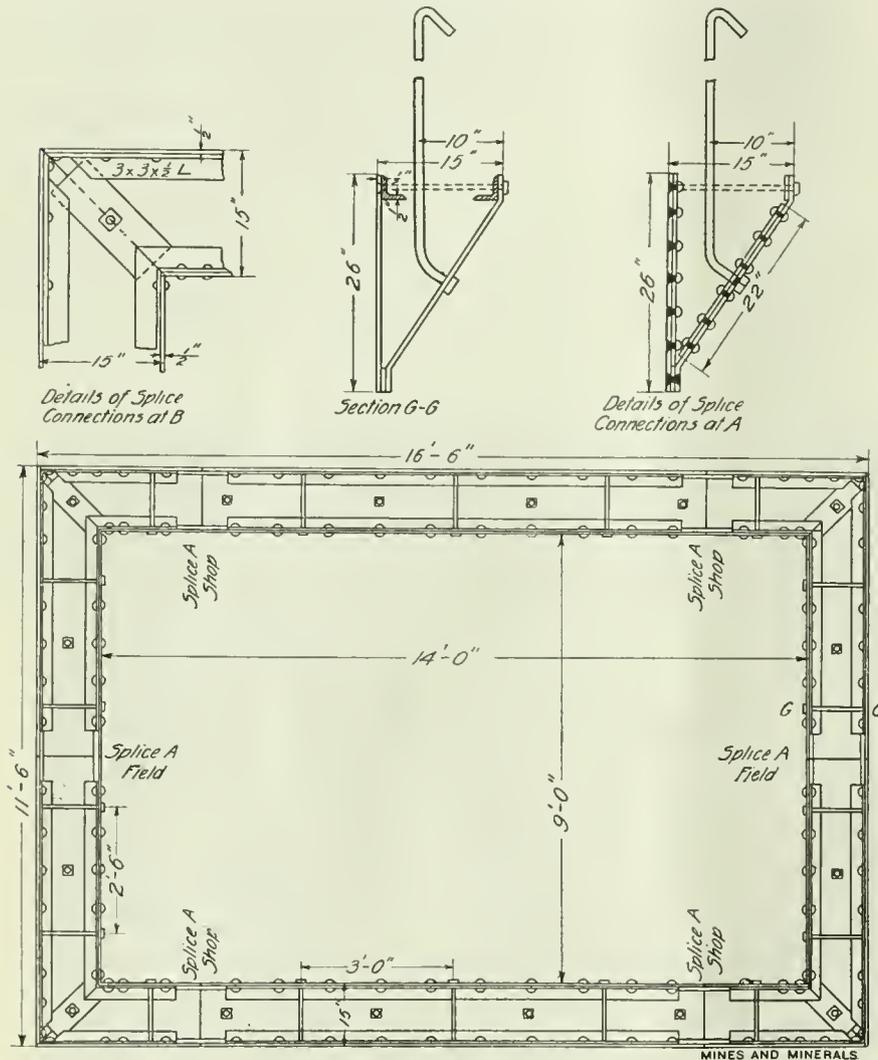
PLAN AND DETAILS OF STEEL SHOE
